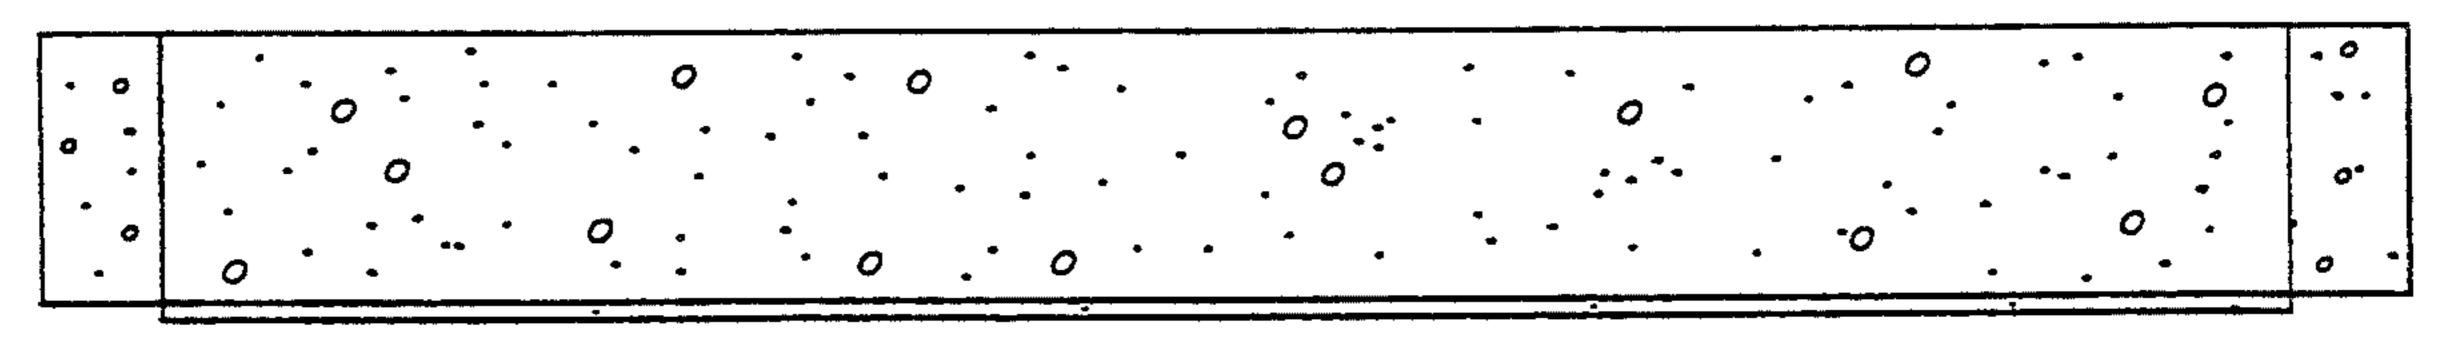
is a plan view of a building component for a noise barrier retaining wall, illustrating the profile of the building component for a noise barrier retaining wall as viewed from above, as well as an interconnecting feature of the building component for a noise barrier retaining wall of the present invention;
